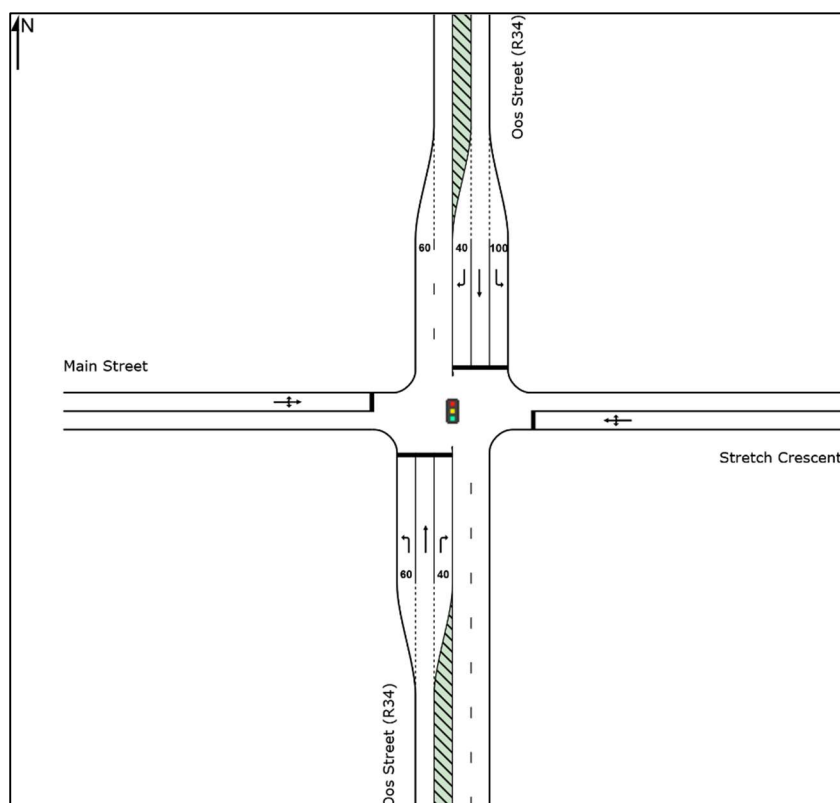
Oos Street (R34) and Stretch Crescent/ Main Street - Proposed Layout (2027)
